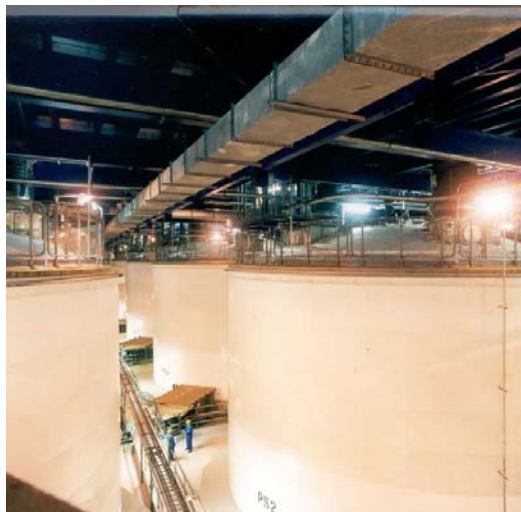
Tank Improvement - Welded steel jackets
